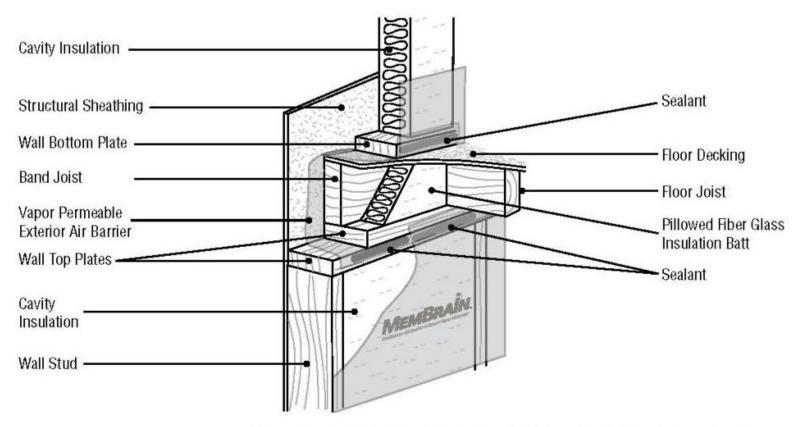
Detail B - MemBrain Air Barrier System interior floor intersection details.
